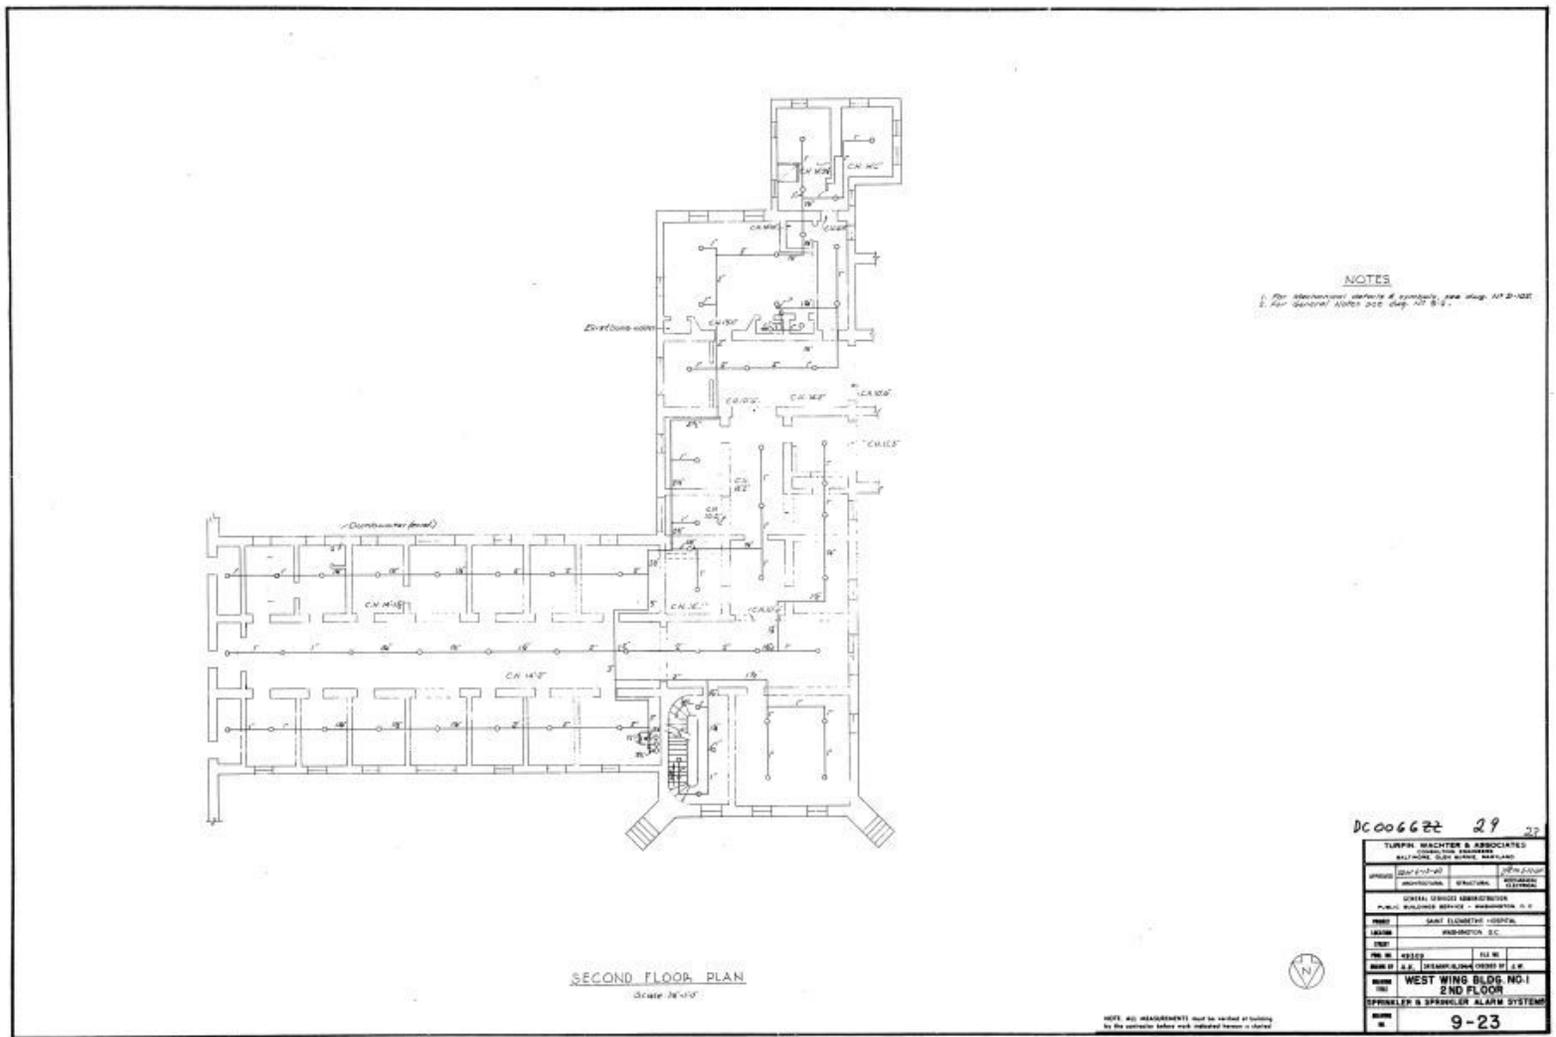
Second Floor Renovation Plans, West Wing, 1964. Source: GSA archives, image DC0066SE0029.
